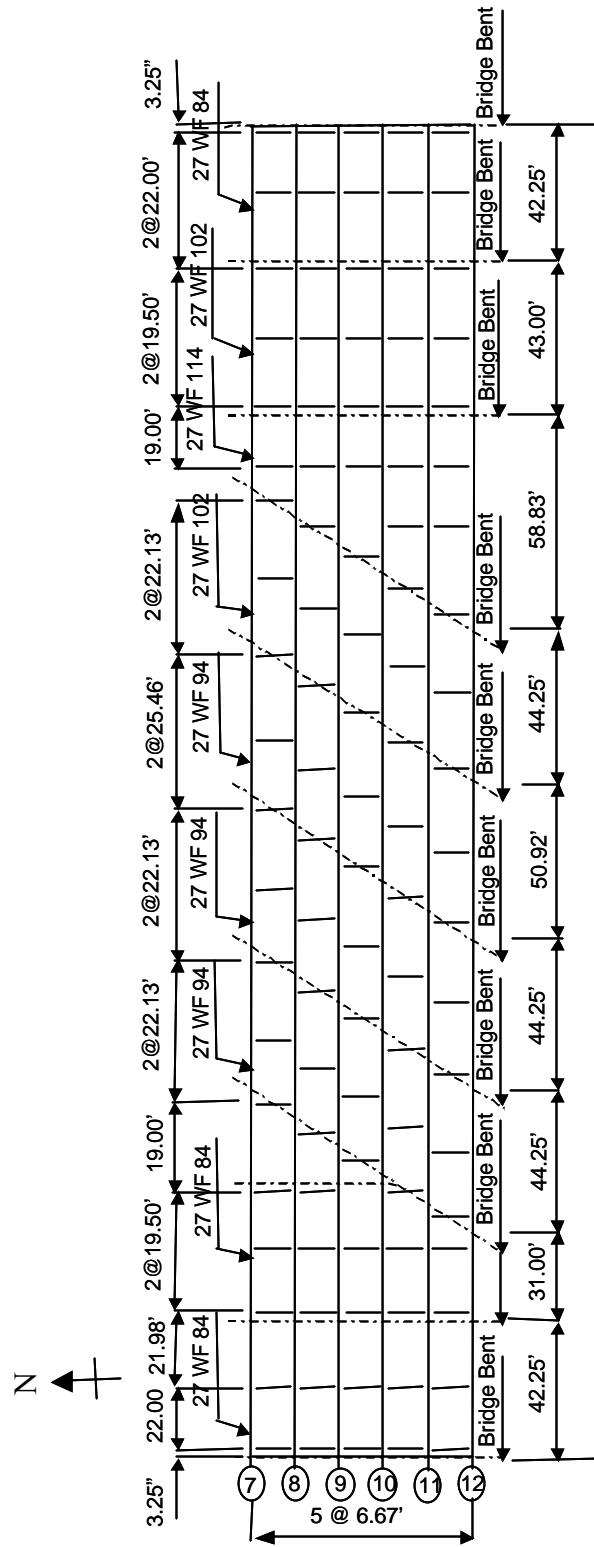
Framing Plan of U.S.-20 Bridge near Michigan City
